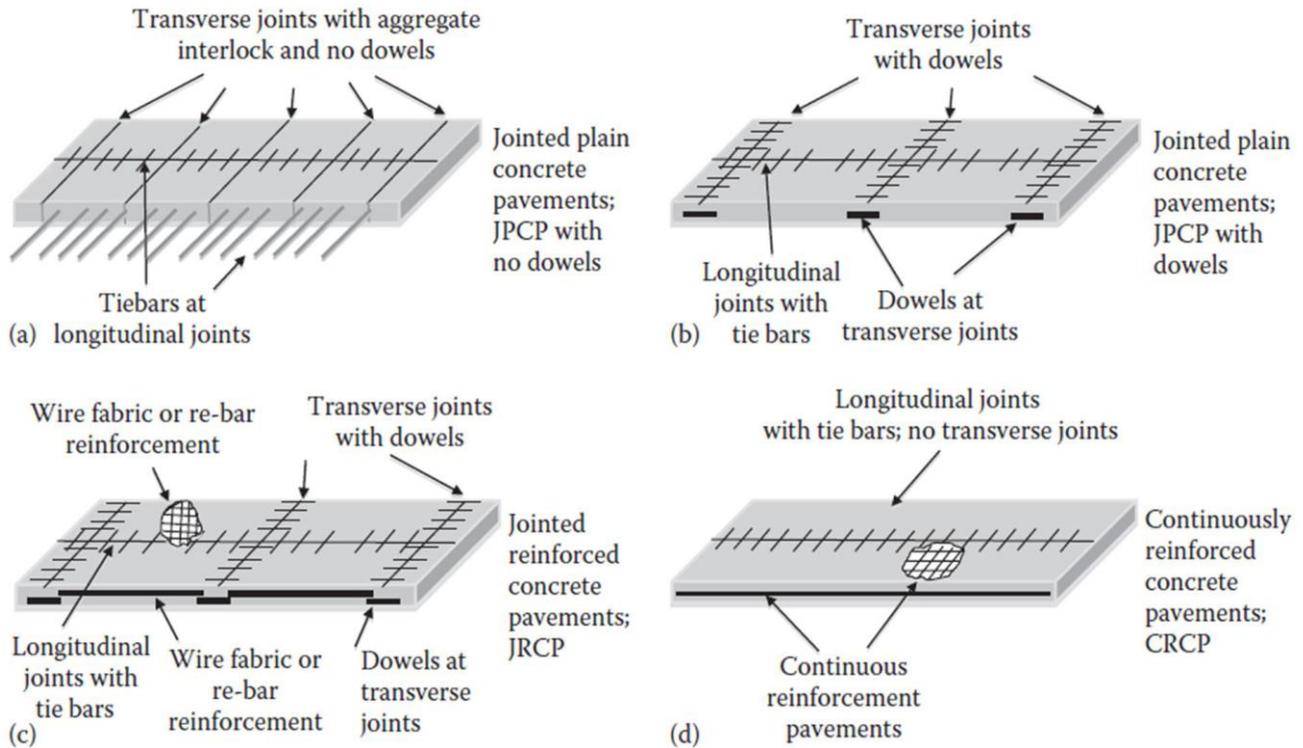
Jointed plain concrete pavement (JPCP) with tiebars and (a) no dowels, (b) with dowels, (c) jointed reinforced concrete pavements with tiebars and dowels, and (d) continuously reinforced concrete pavements (CRCP). The slab has continuous reinforcement.
